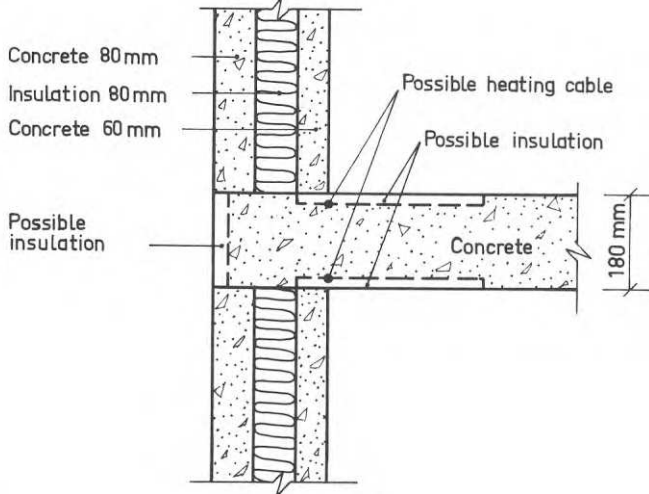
Design at external wall of sandwich type with concrete leaves at the inside and outside. The design is defective, inter alia with regard to the moisture barrier.
